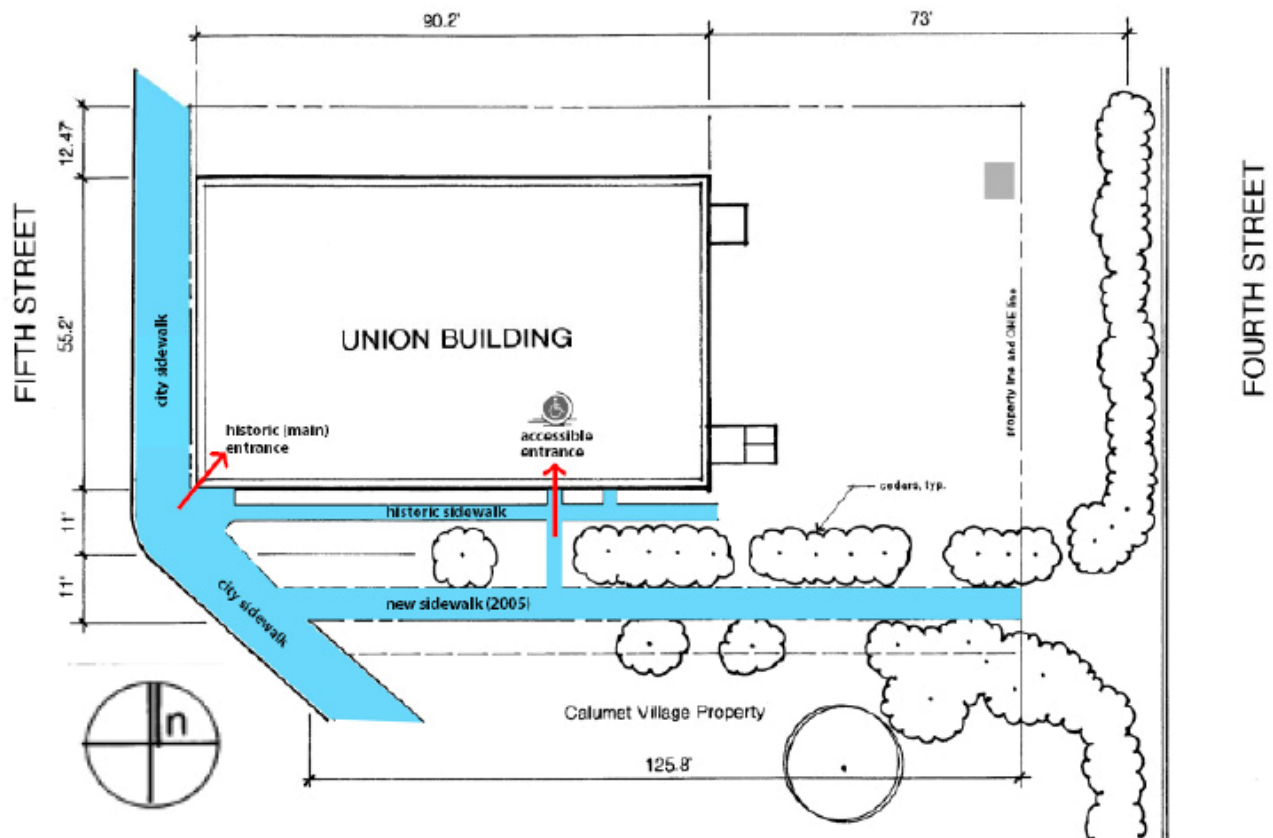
Plot Plan of the Union Building Site (SmithGroup)
